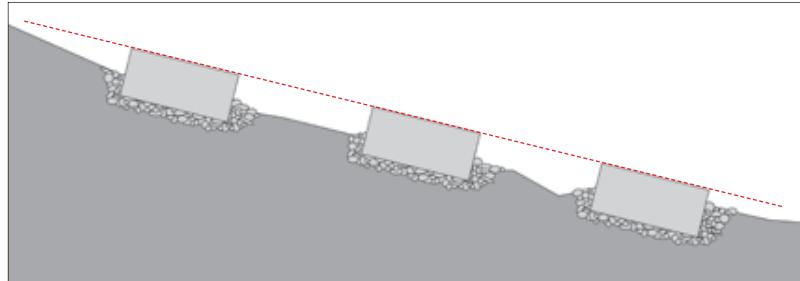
2 (flush alignment of the concrete foundations)
